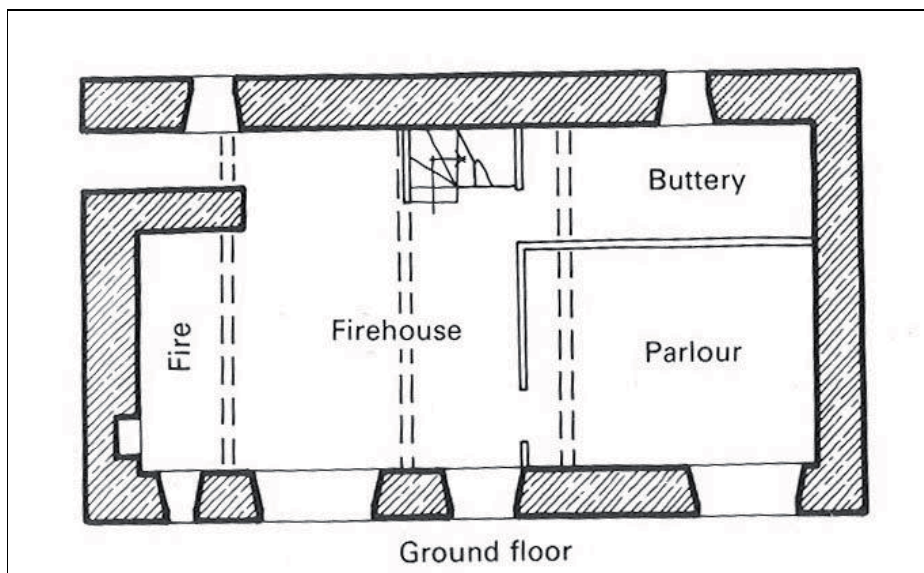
Sketch plan showing what the original layout of the ground floor of the earliest phase of the house may have been (Source: Denyer 1991)
